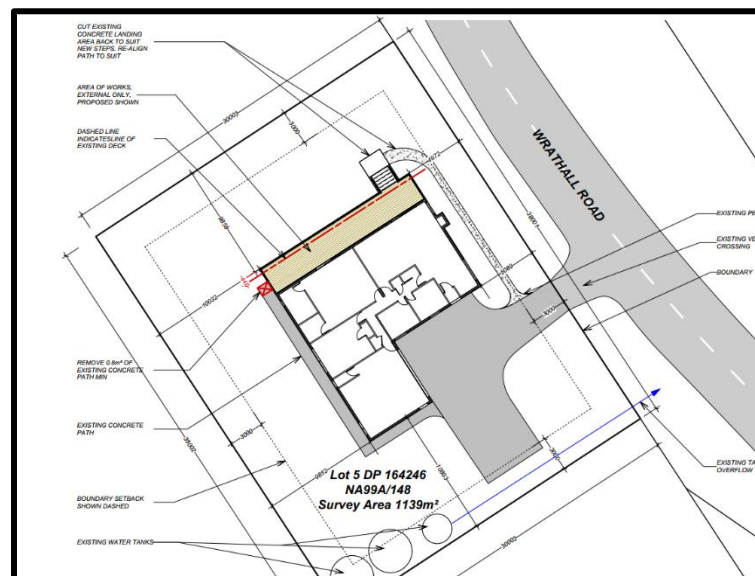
Site Plan showing deck to be replaced and location of other features on the site.
